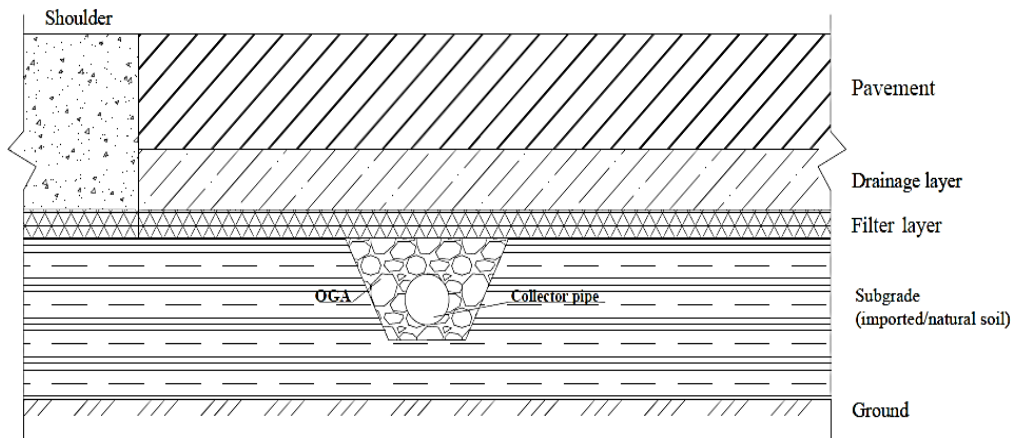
Underdrains (Open-graded aggregate) (Dawson, 2008)
